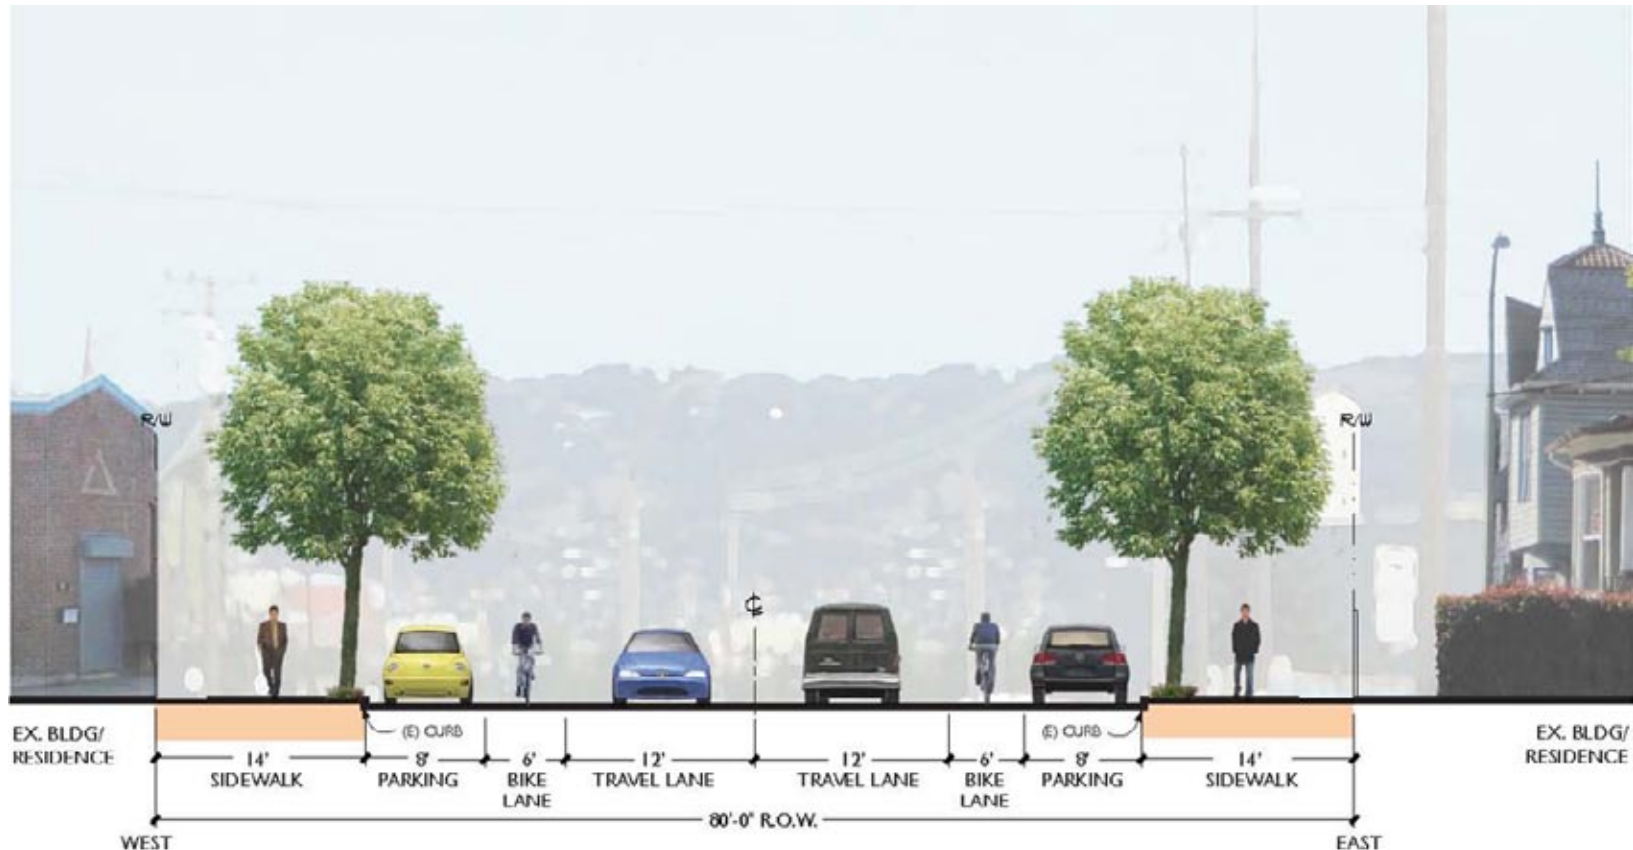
Potential Cross Section with Striped Bike Lanes
